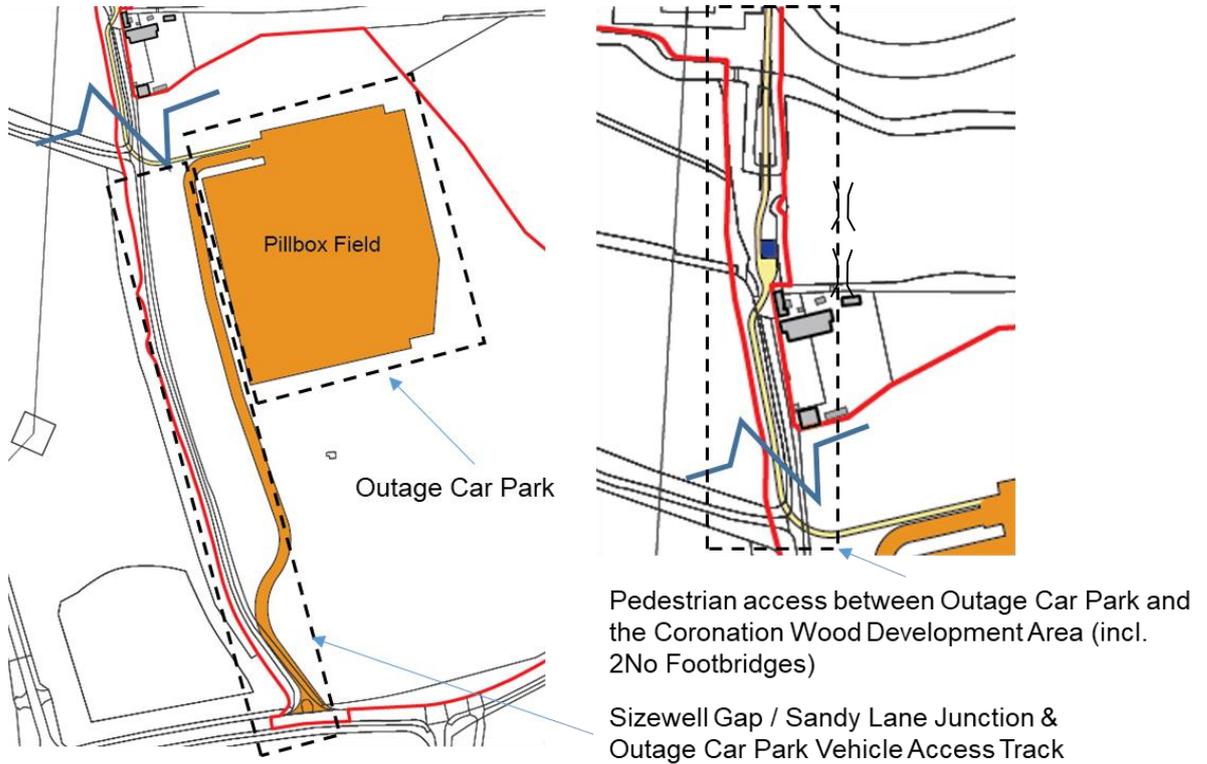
Pillbox Field Proposed Outage Car Park Plan
